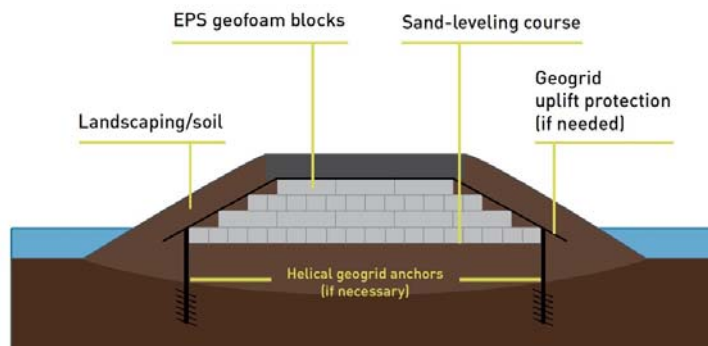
Cross section showing levee repair using Geofoam blocks [27]
